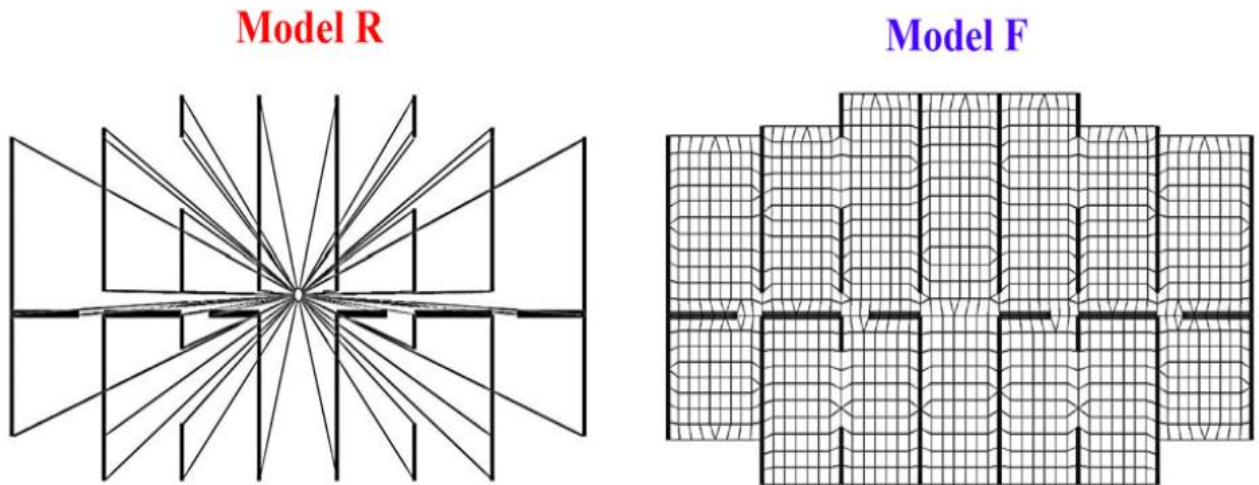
Rigid and flexible diaphragm of Shear wall building [16]
